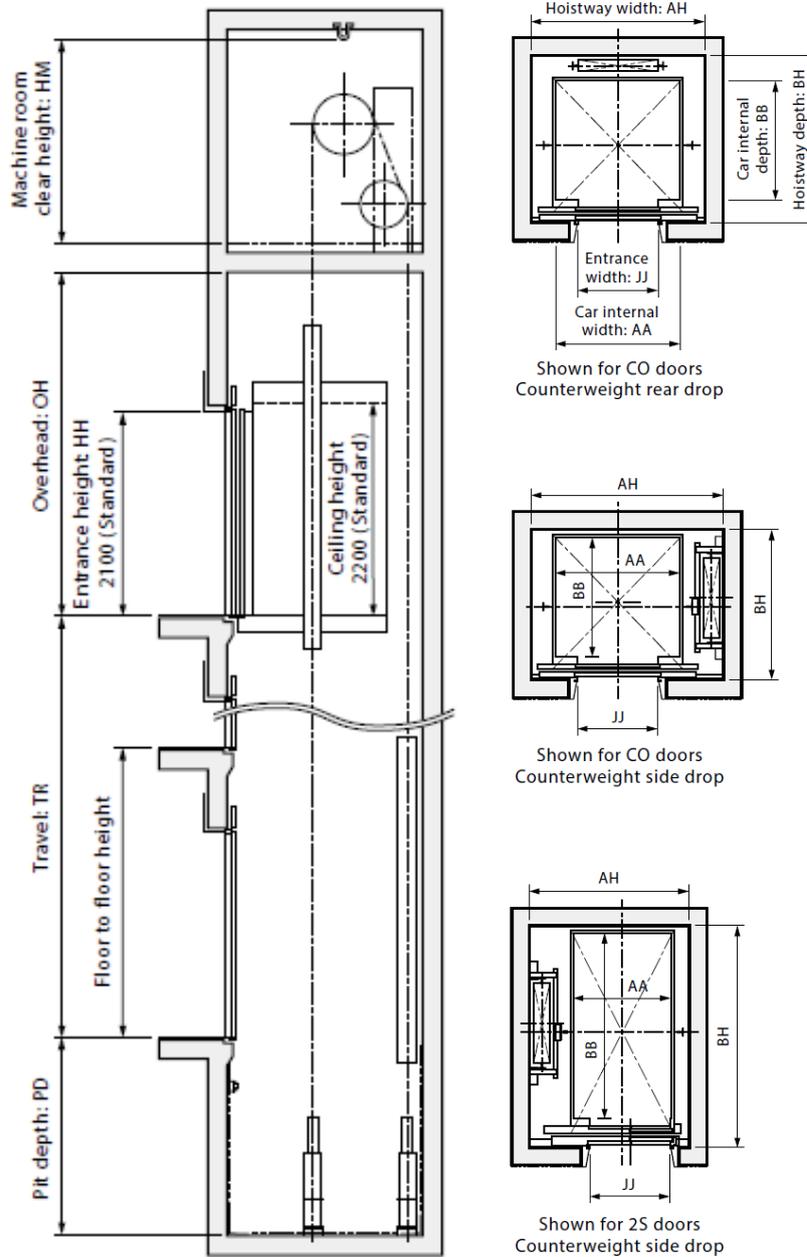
Typical layout of lift in shaft (Source: www.mitsubishielevator.com)
